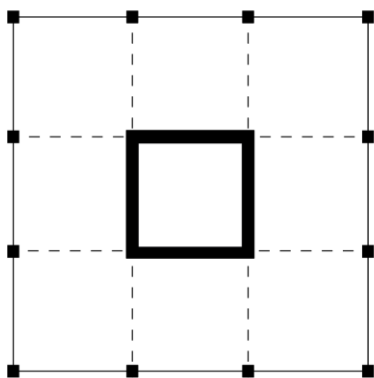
Typical plan of shear wall- hinged frame structure with core
